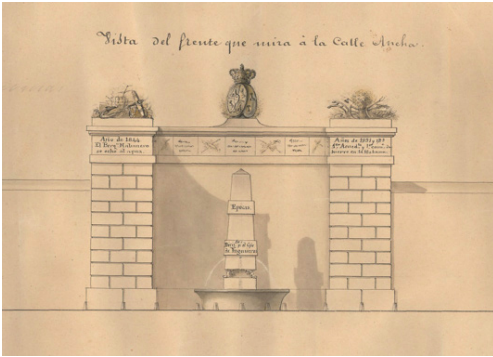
Eugenio Campos de Letamendi, *Plano y Vista de una Fuente que se proyecta construir en el muro exterior del Real Arsenal de Marina, [1848-50?]*, General Archive Madrid, Spain (and details)
